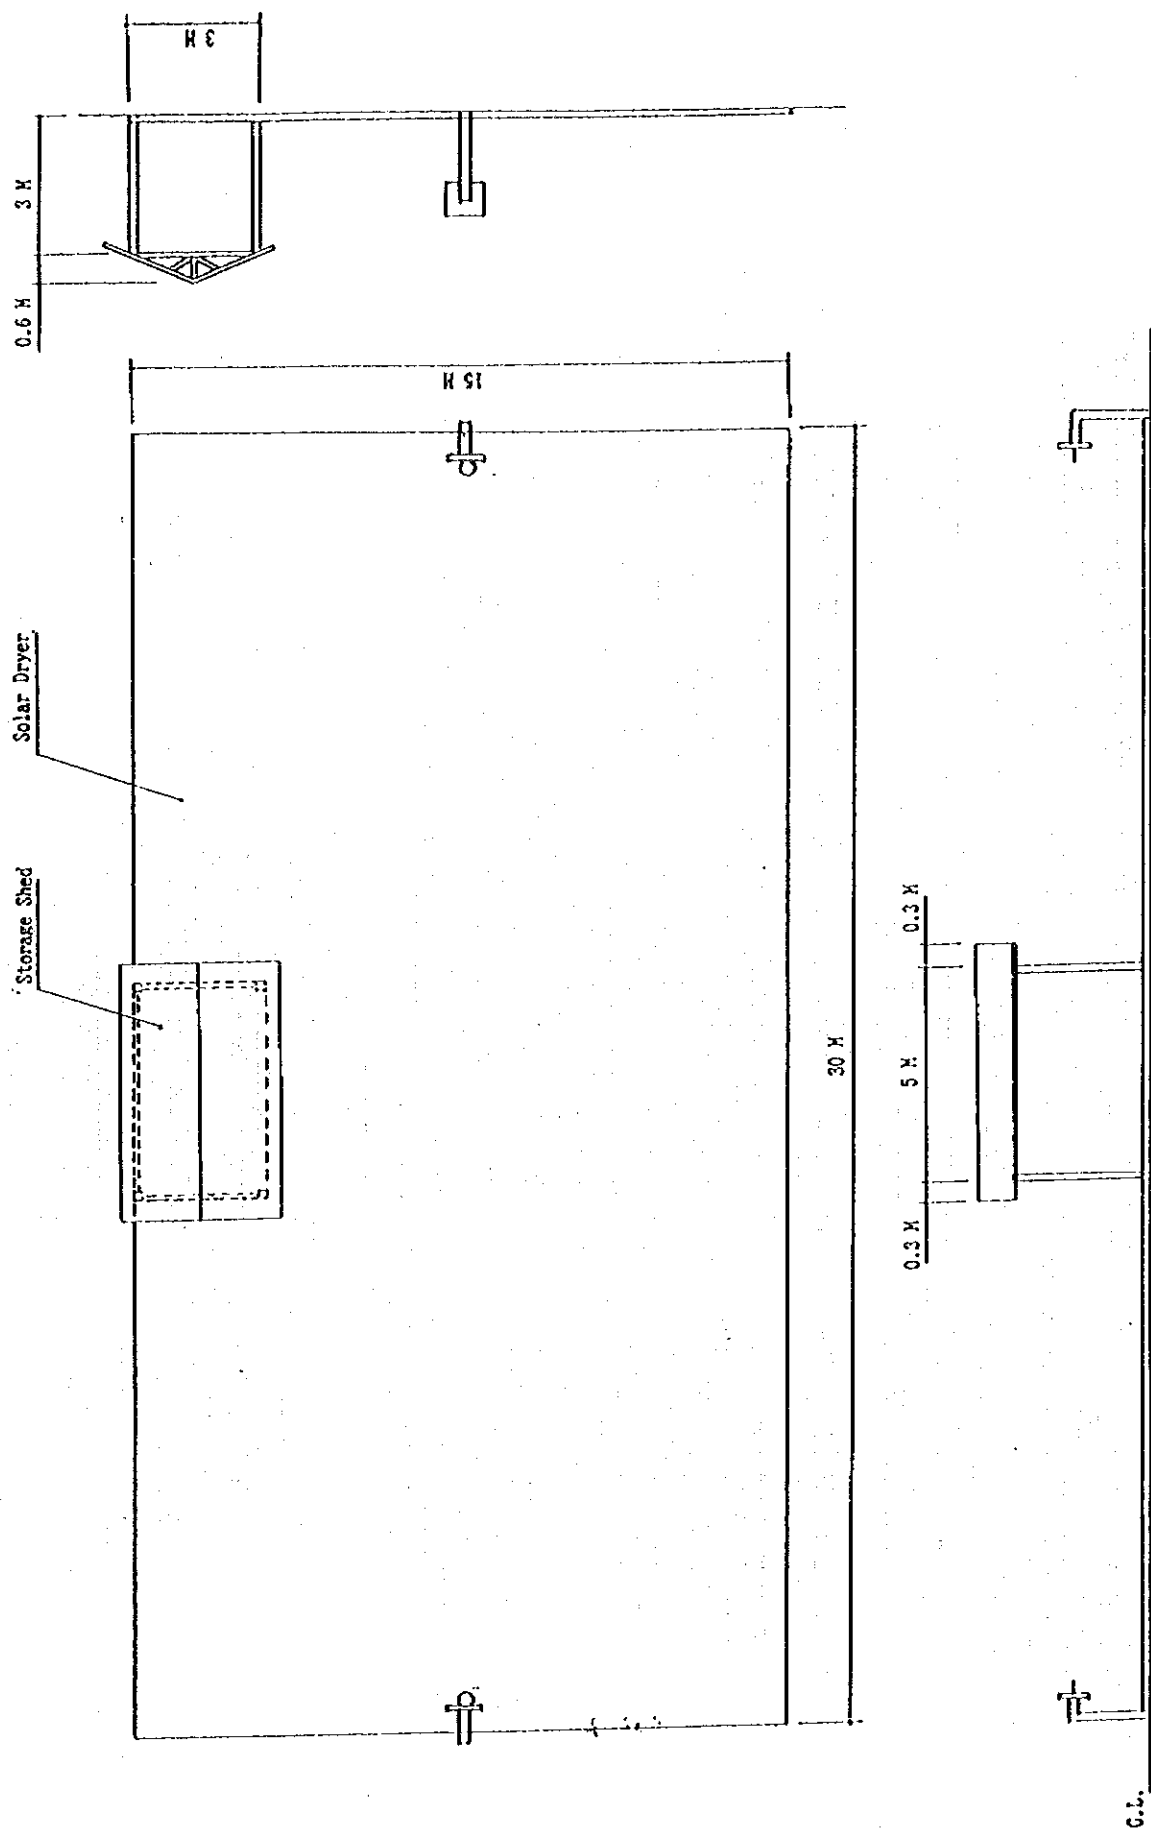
PROPOSED PLAN OF MULTI-PURPOSE DRYER
